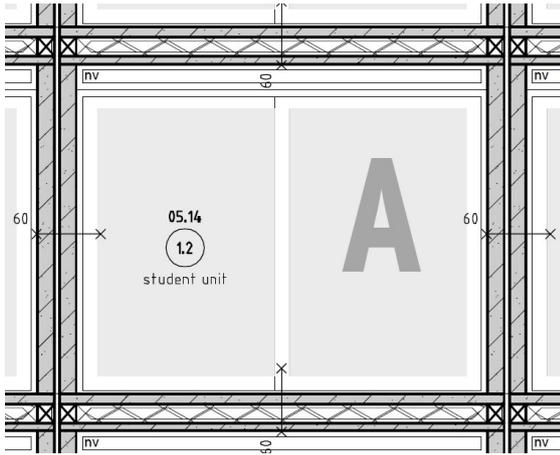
Cross-section of a module (Pieters Bouwtechniek).
